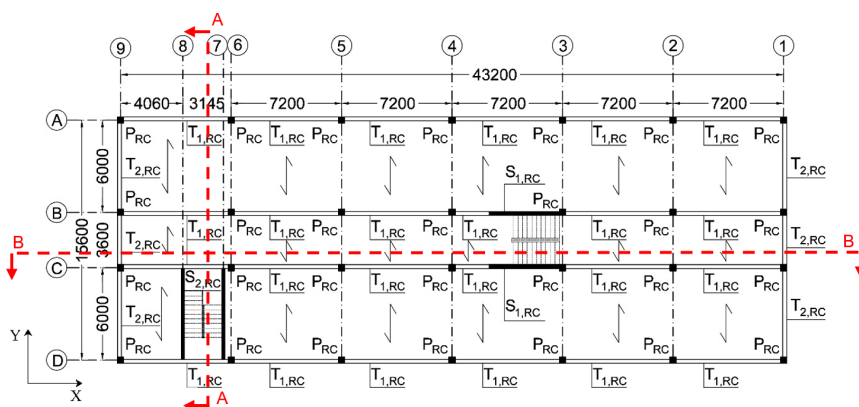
First floor plan with alphanumerical alignment identification and reinforced concrete (R/C) beam numbering.
